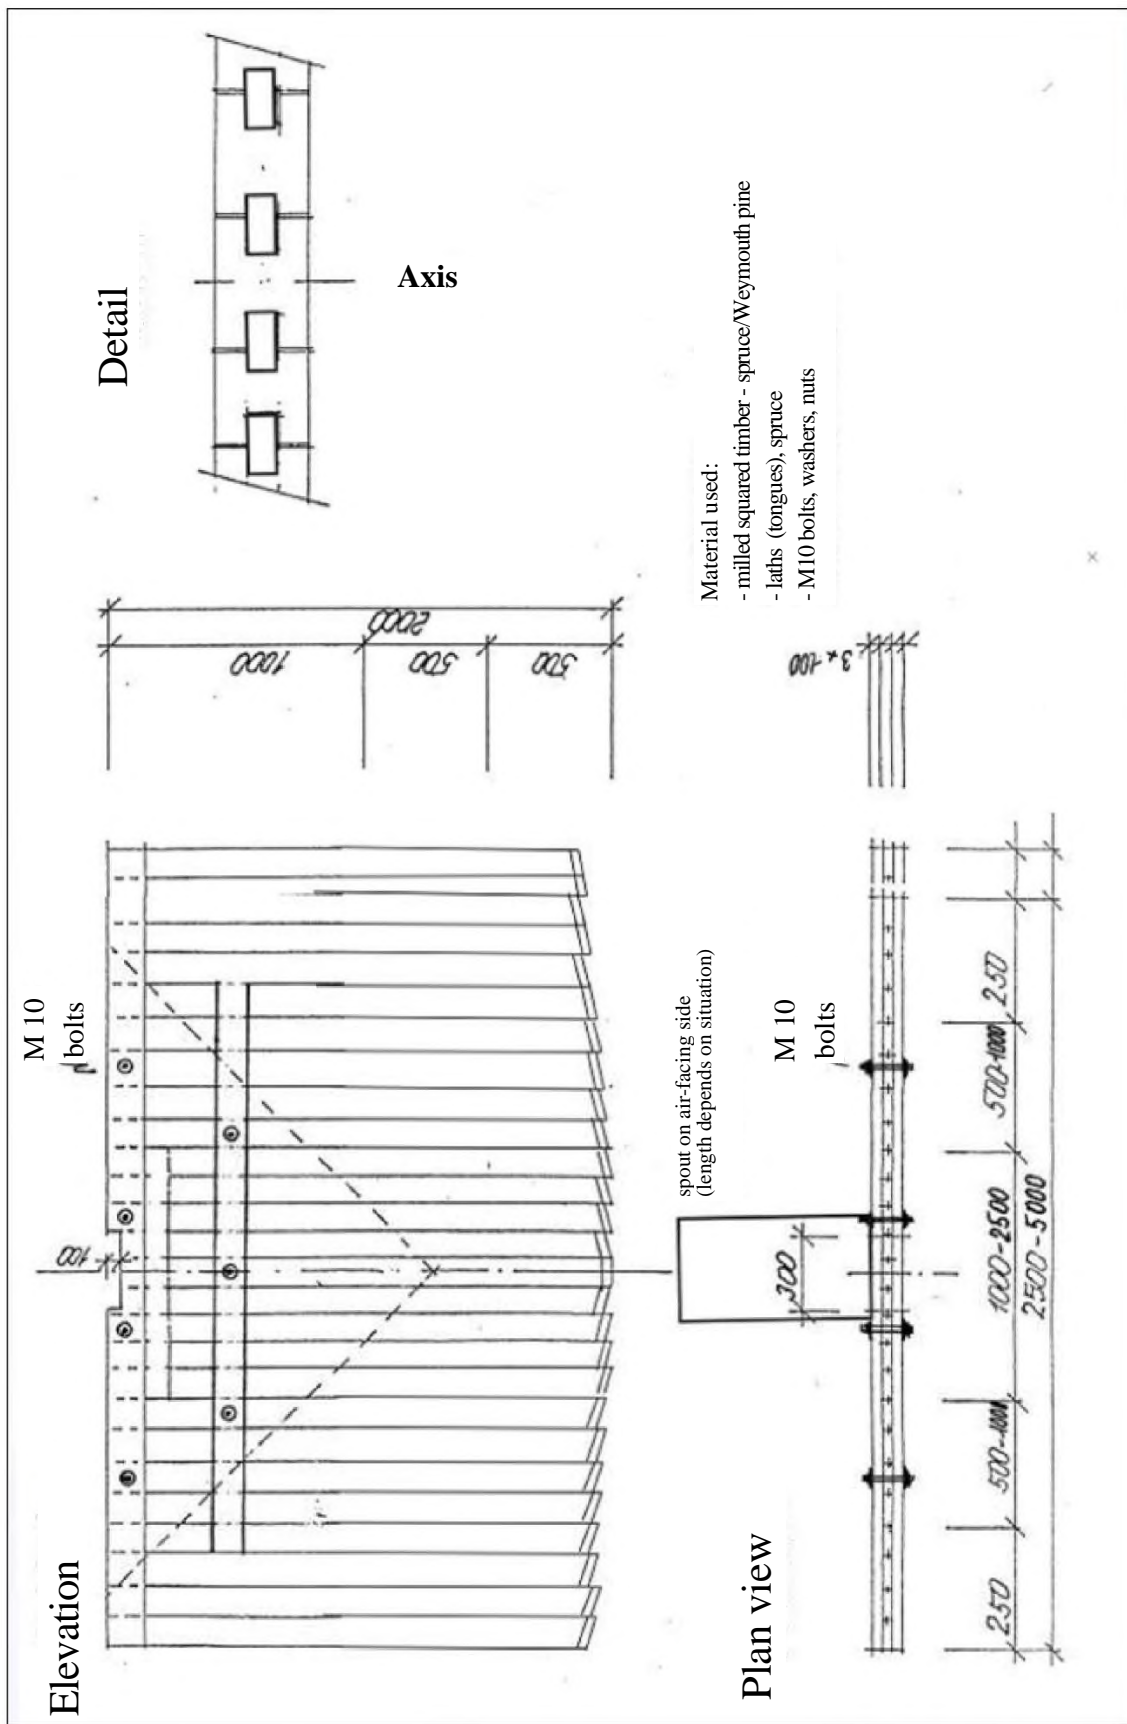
Schematic of vertically installed dam made of machined planks, groove-and-groove joints.
